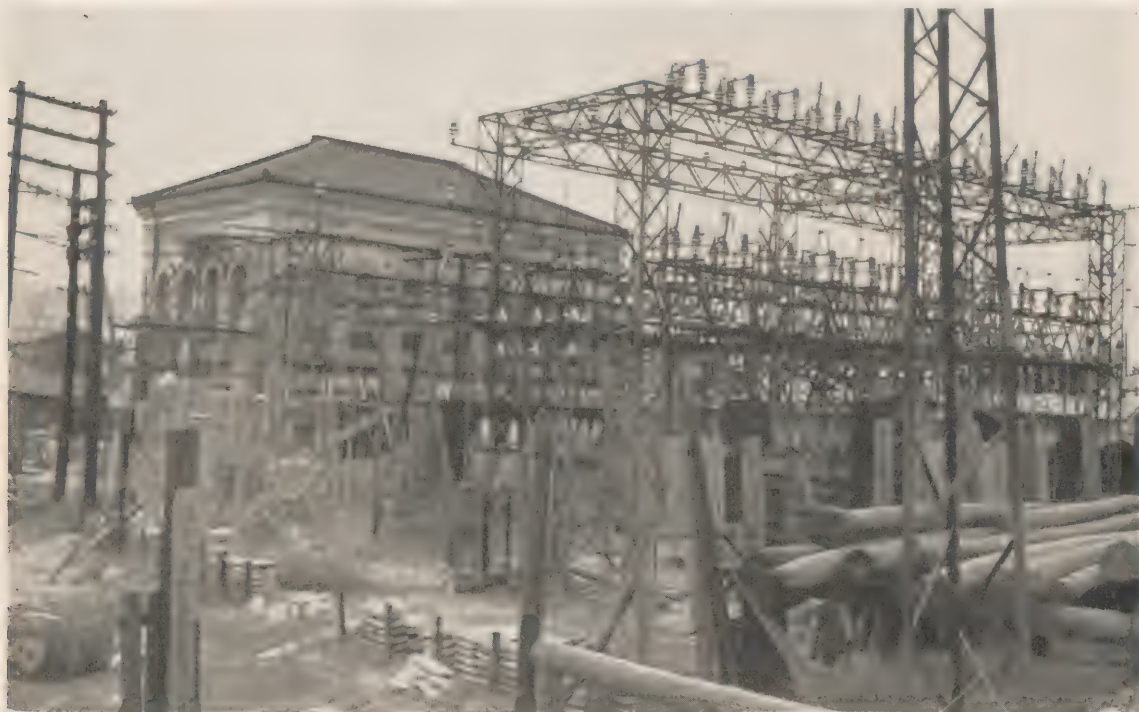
XIII. Dambara substation showing undamaged busbars and transformers, 7,900 feet from GZ.
